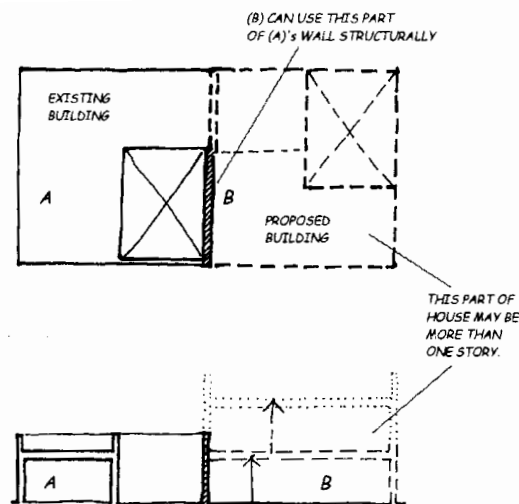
The condition of using a common wall in the construction of a new structure as a supporting wall (Source:Hakim, B., 2001, p.17).
